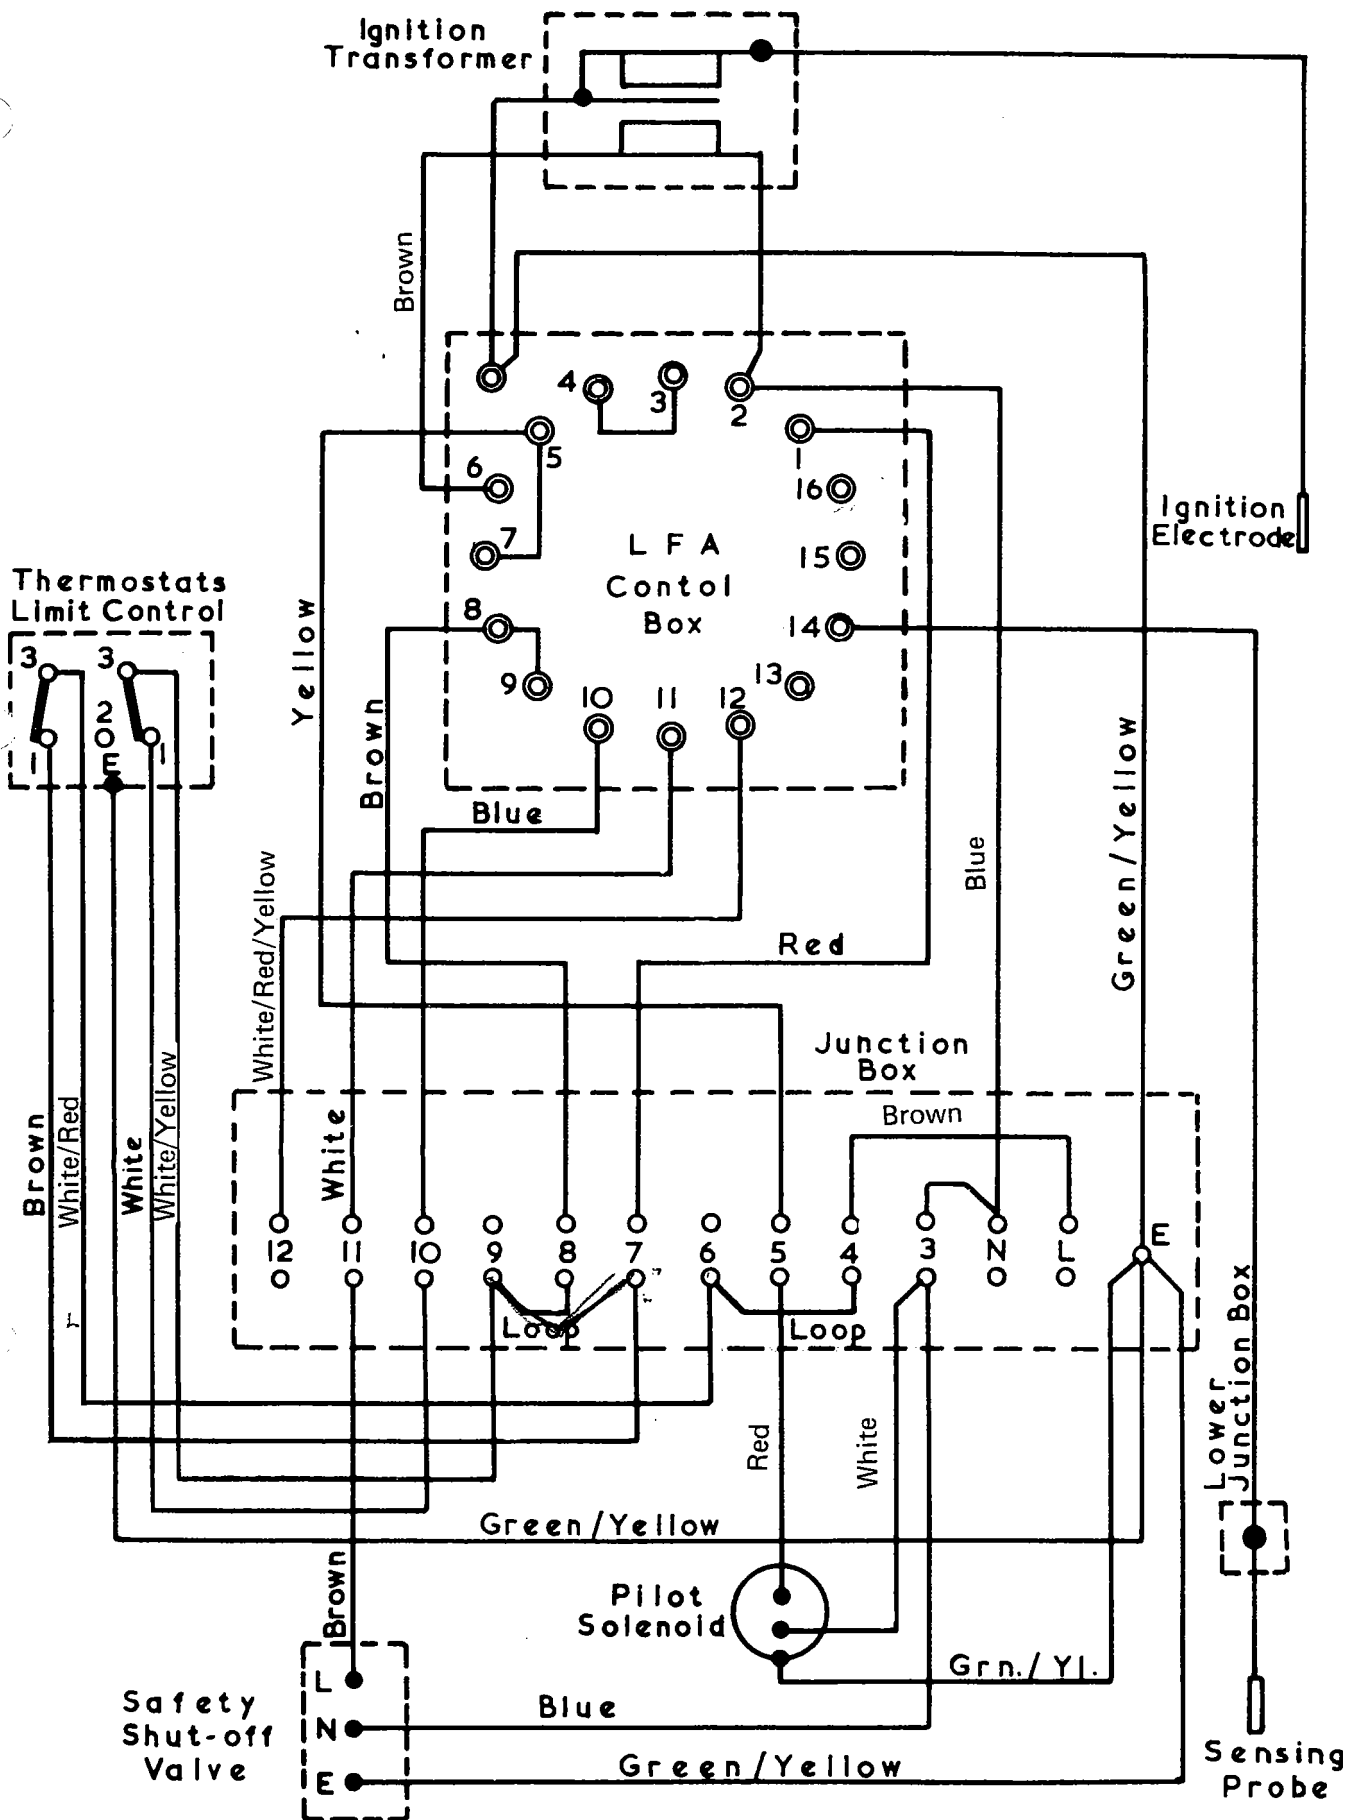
INSTALLERS WIRING – TOWN GAS BOILERS
